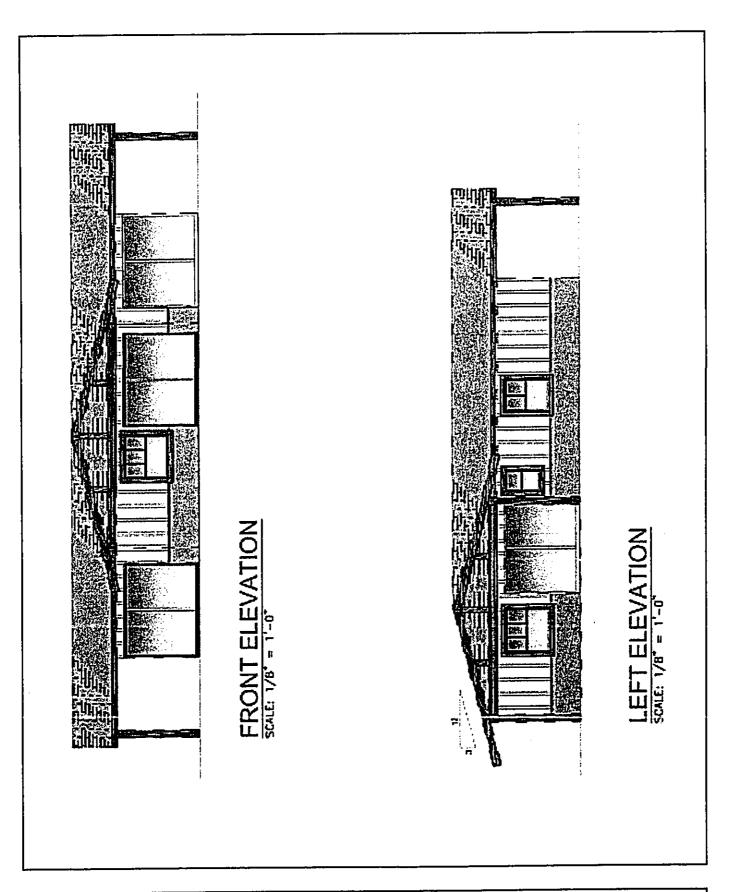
Studio Housing Elevation Source: CJS Group Architects
